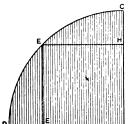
Developed Right Section Which Belongs to the Plane L O of the Plan Fig. 76.
